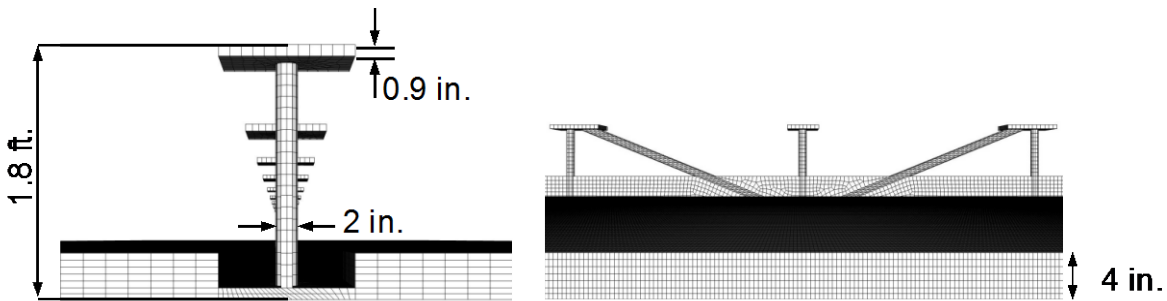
Mesh used for the Ted Williams Tunnel ceiling structure (concrete panels supported by stainless steel hangers and plates) for heat transfer simulation: a) front view, and b) side view.
